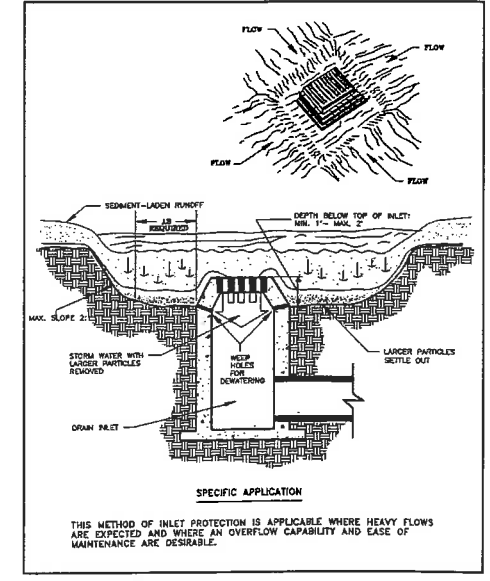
Excavated Drop Inlet Sediment Trap
